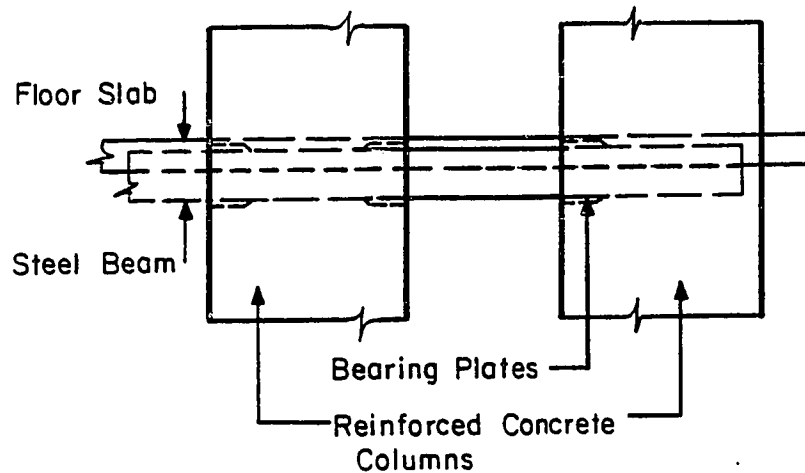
Typical connection details used by O'Leary and Undrill (Ref. 37).
